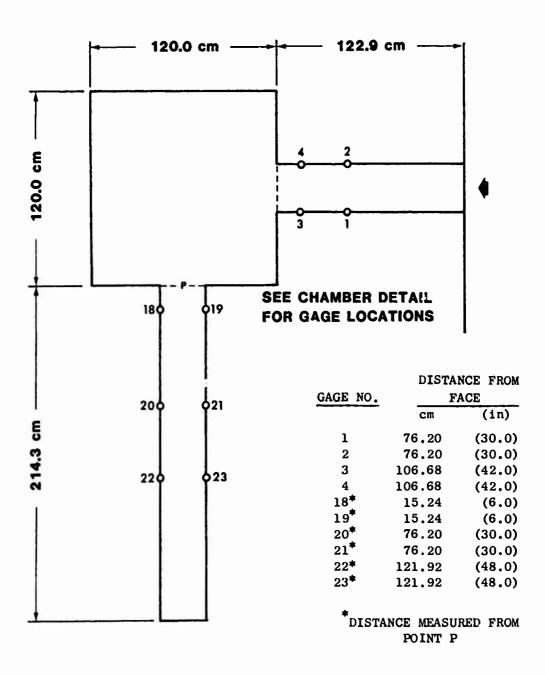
Top view of vented expansion chamber and gage locations in entrance and exit tunnels.
